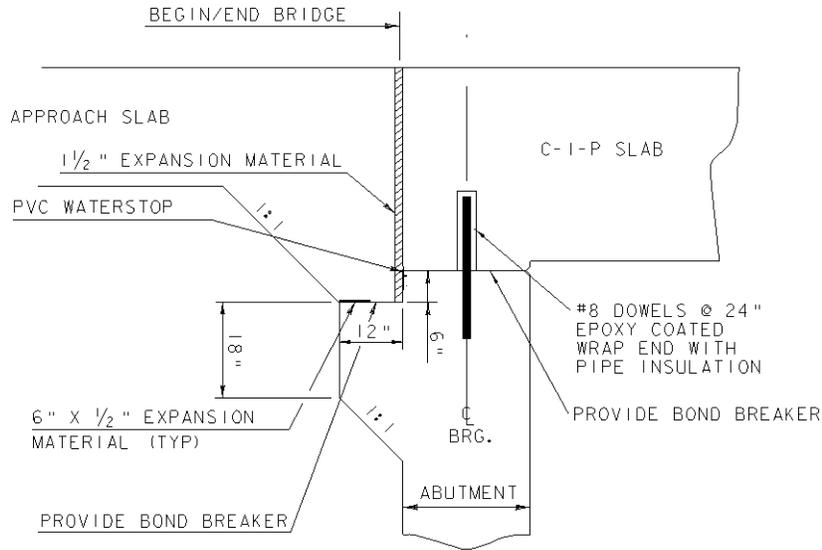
1 Cast-in-Place Concrete Slab Type C Bridge End Detail
